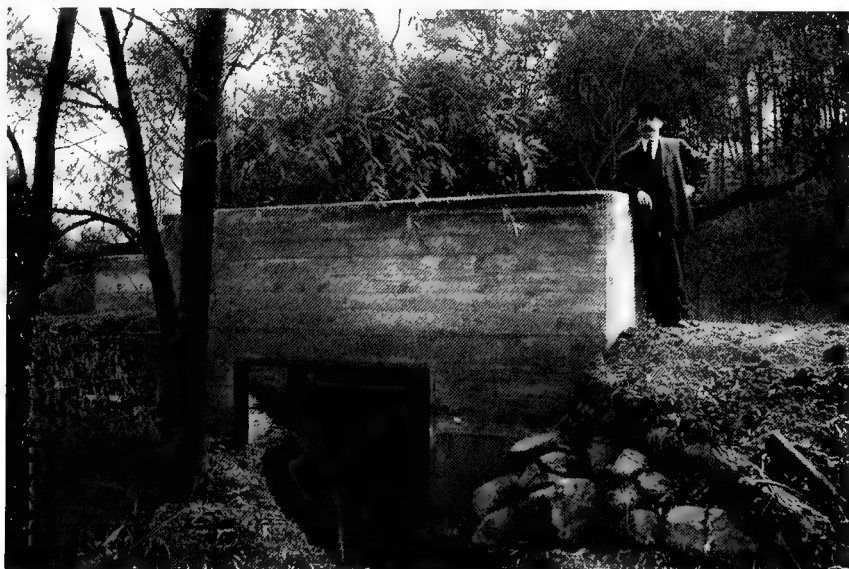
Concrete Culvert, Town of West Bloomfield, Ontario County, New York. Designed by New York Highway Commission. Span 4 ft. Roadway 22 ft. Cost \$375. Culvert has been built at an angle to the axis of the stream flow.
